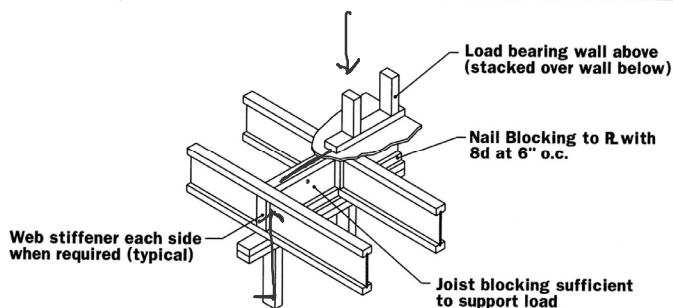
Continuous I-Joist Over a Bearing Wall Supporting a Wall Above
